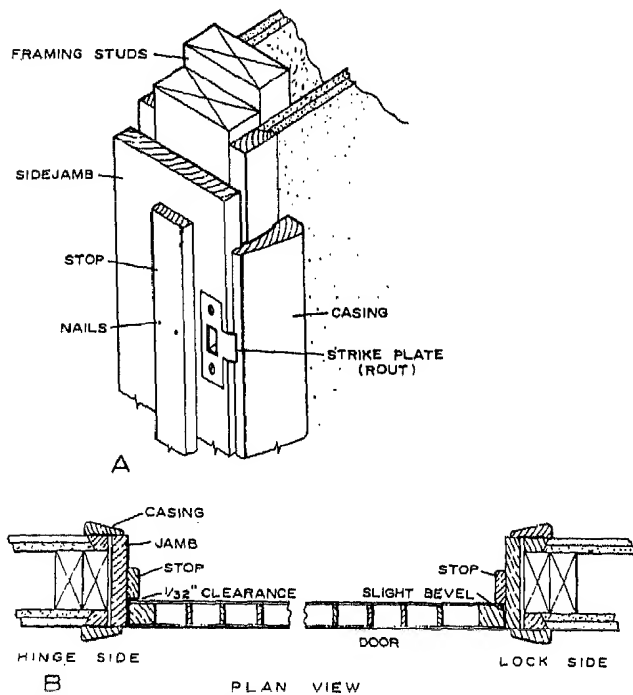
Door details: A, Installation of strike plate; B, location of stops.
